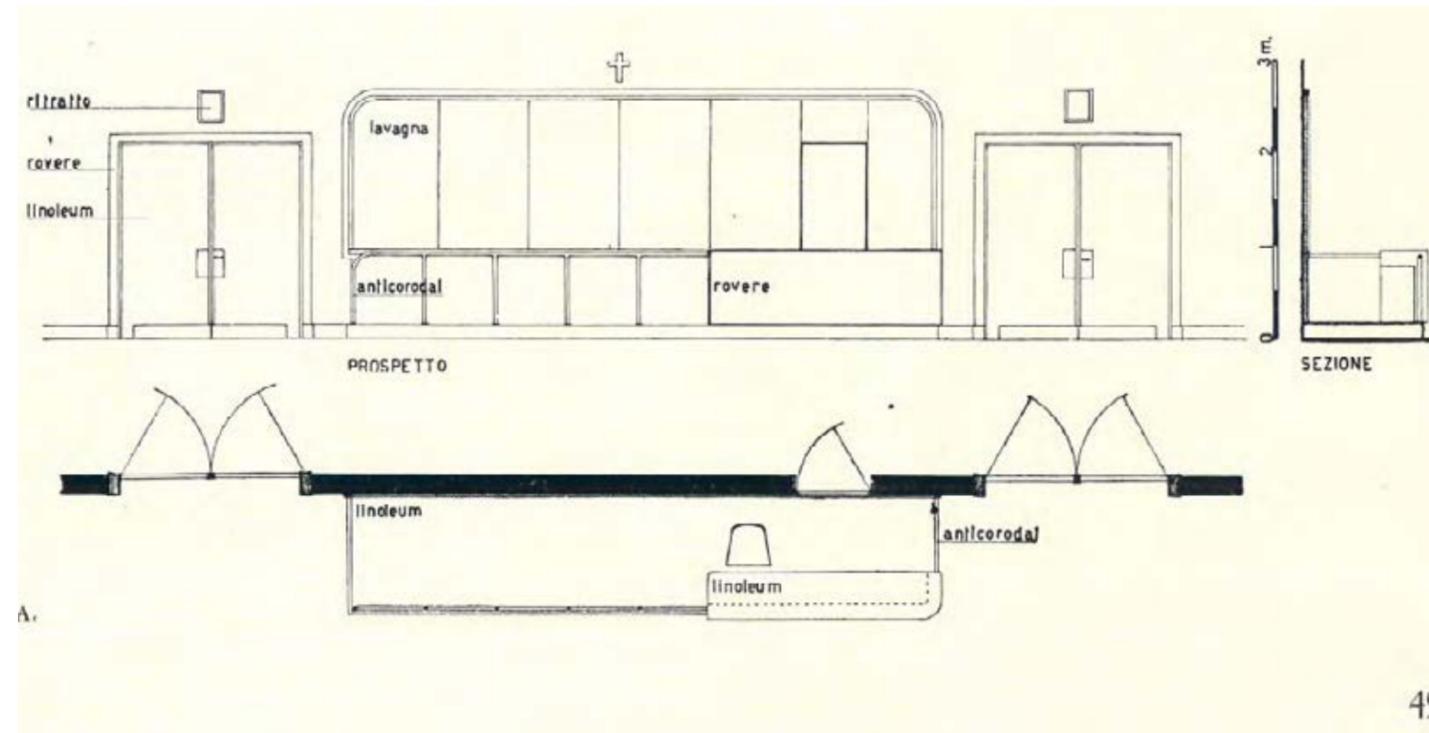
The 'wall system' including footboard / blackboard / desk / railing and wooden wall veneering, with the door opening leading to the changing room; plan, elevation, section (BBL_drw_10)
